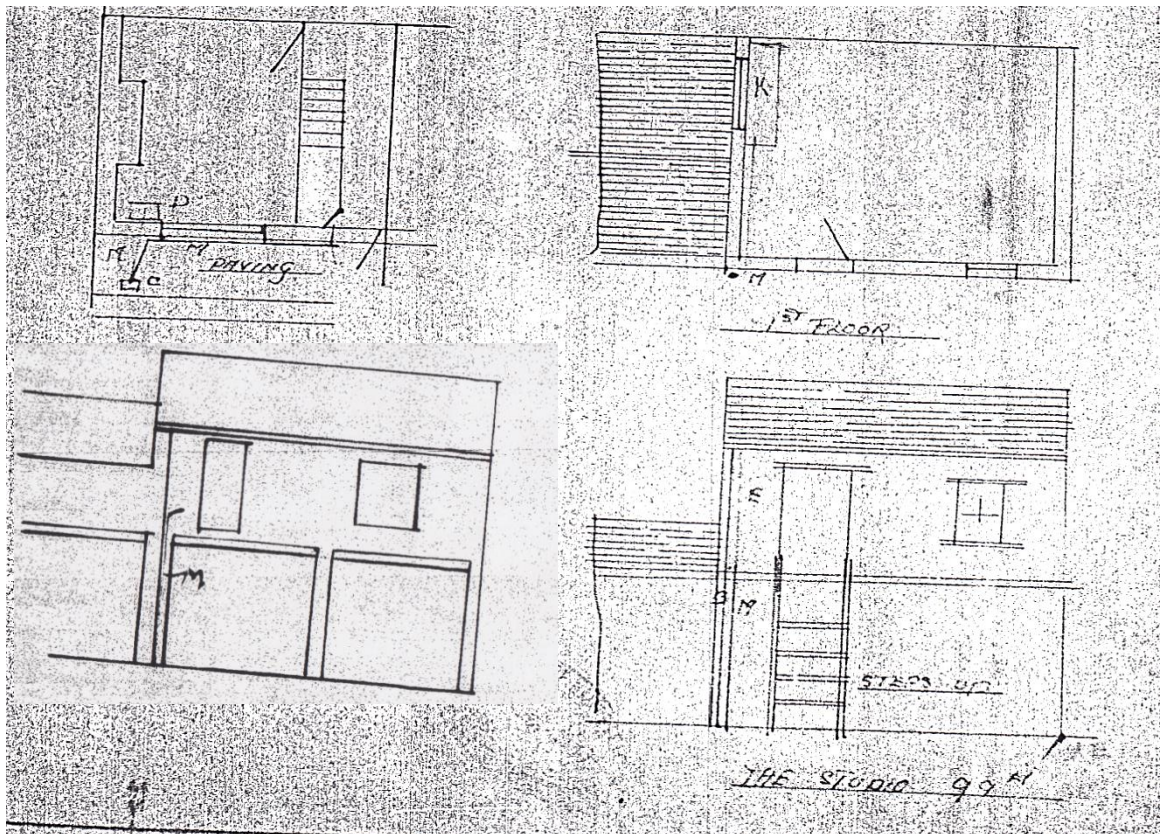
Plan of the rear room of the cottage (top left) and plan and elevation of the stables building (right and bottom left), 1947.
